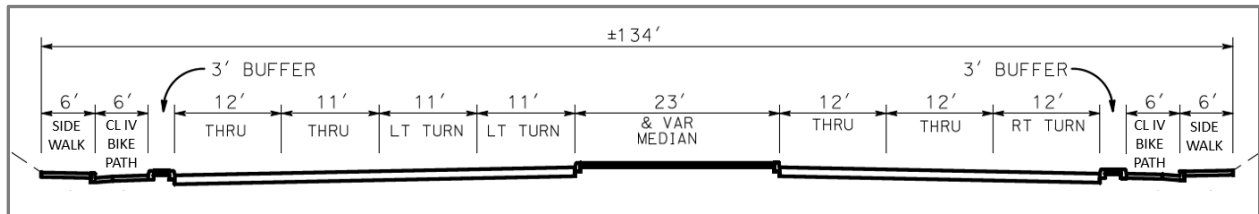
Alternative 5B – Middlefield Road Cross-Section
